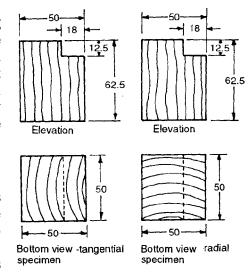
Test Specimen for Shear Parallel to Grain
